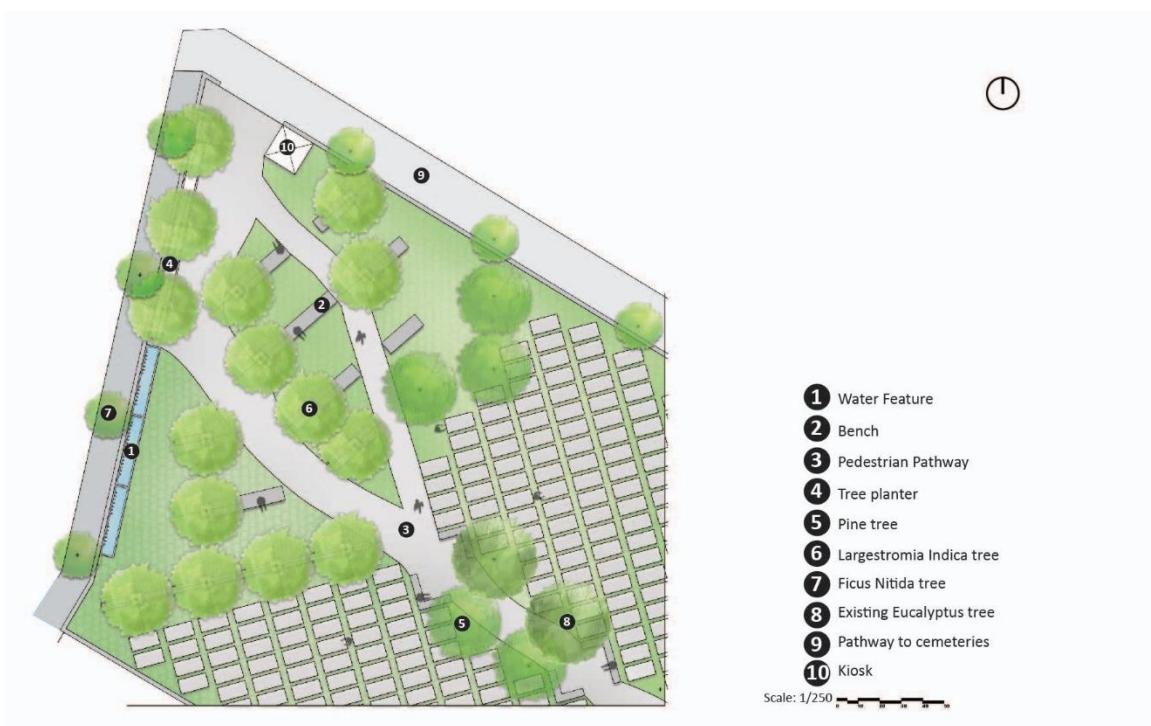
Ein El Helweh Reflection Garden, Site 1, Plan. Source: Author
